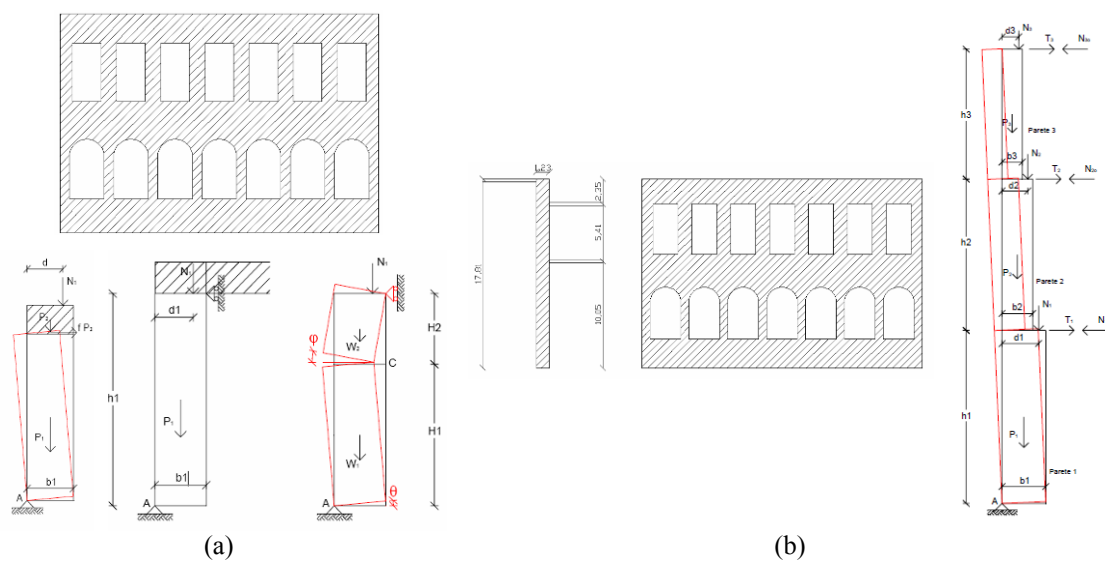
Out of plane failure mechanisms: (a) South wall; (b) North wall.
